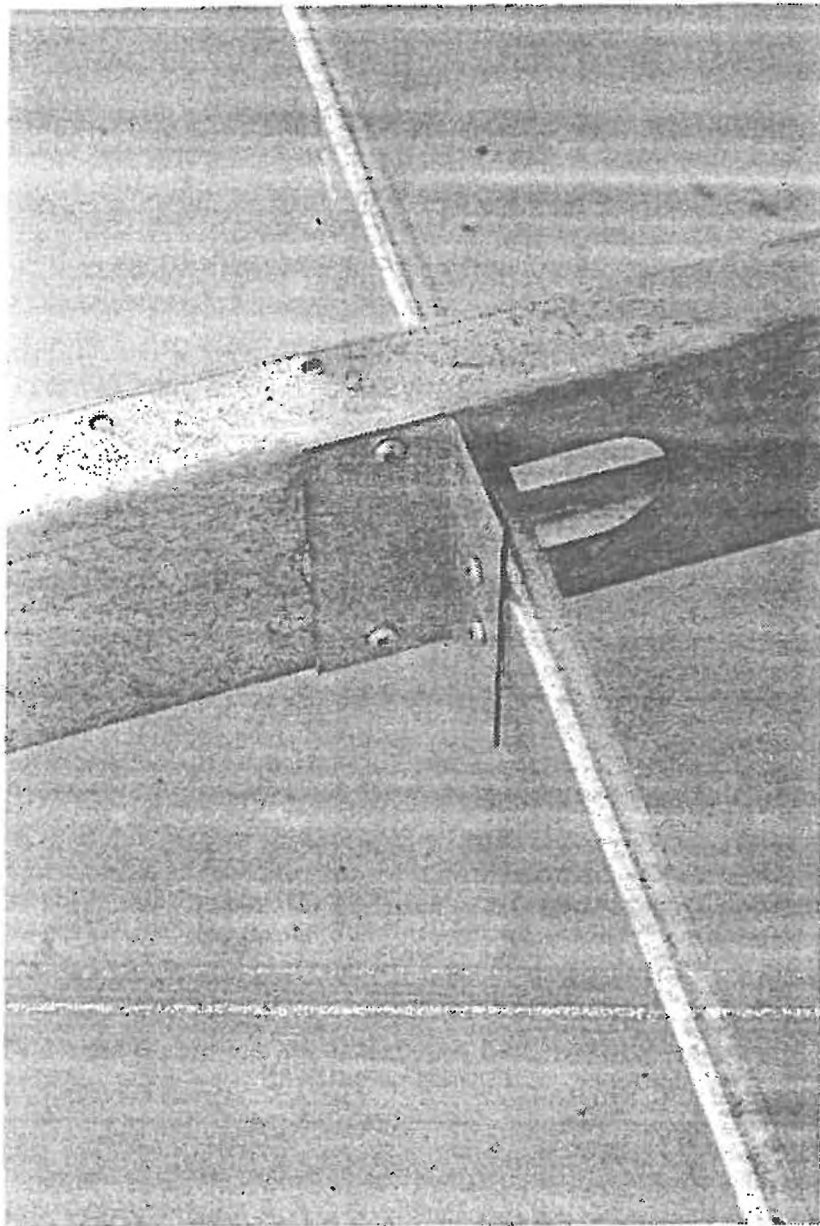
Photograph of Typical Clip Angle Bridging Connection Used in Test Program
